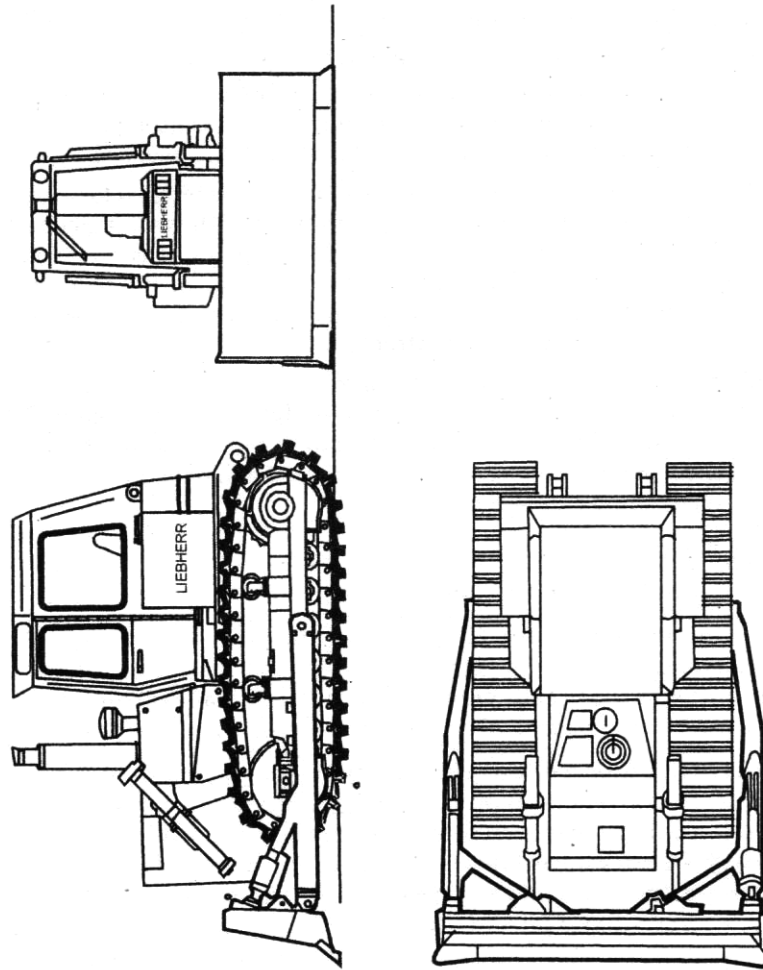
Crawler Dozer with blade. (Courtesy : Liebherr)
